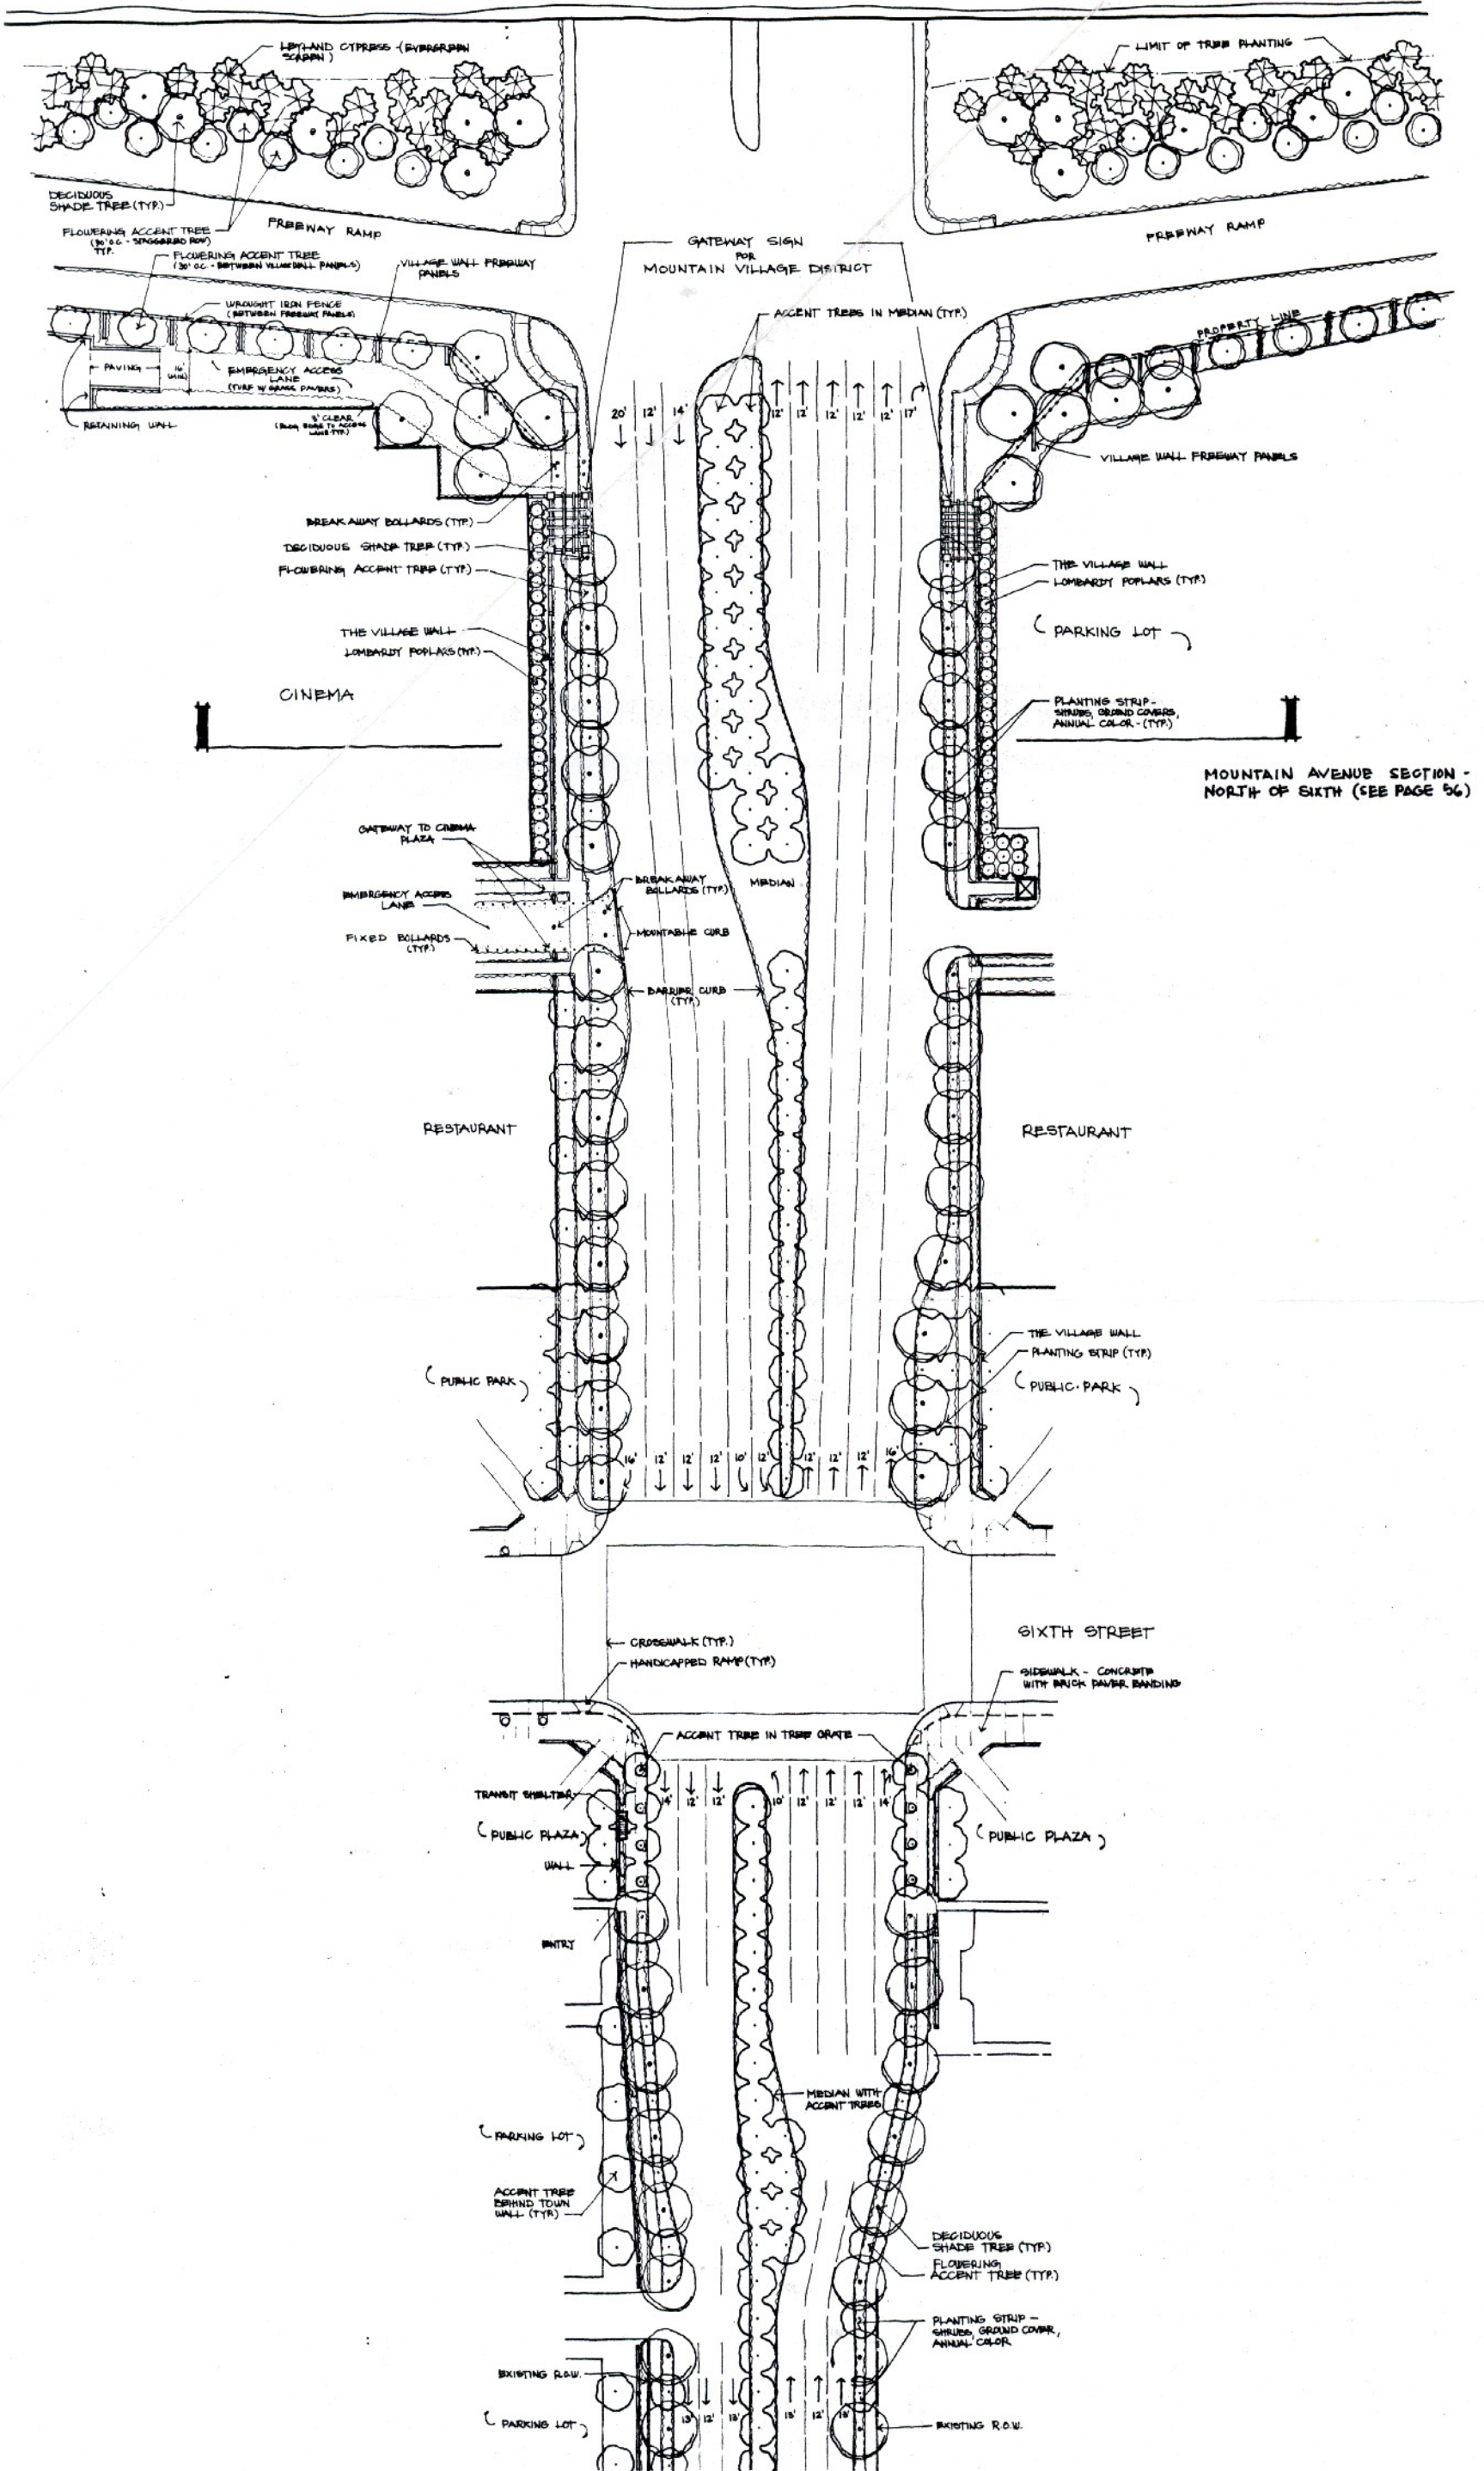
, Mountain Avenue north of Sixth Street Illustrative Plan.
